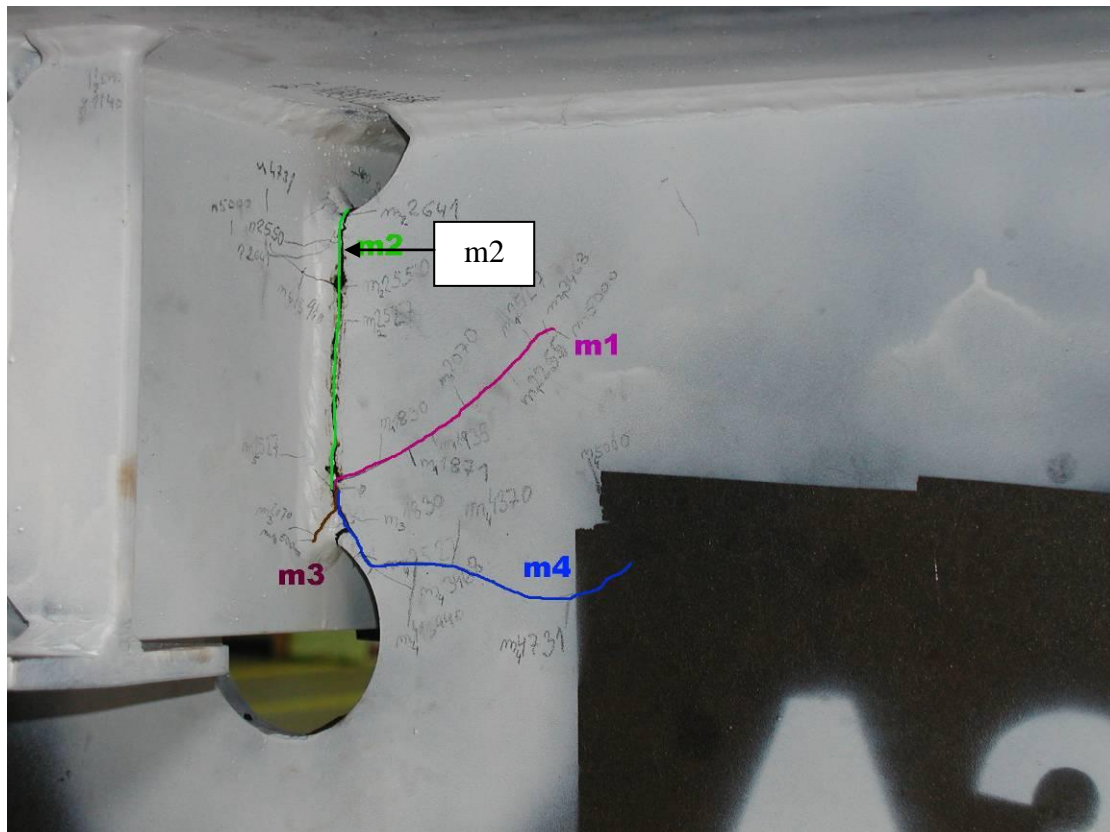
Fatigue cracks in specimen A3.
